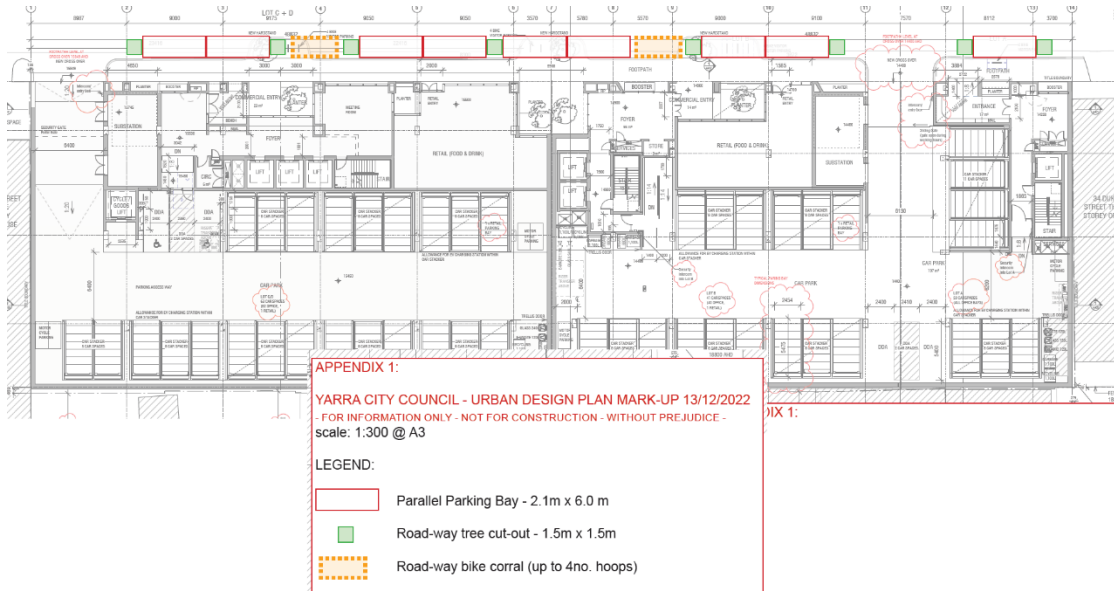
Urban Design Plan Mark-up Plan provided by Council’s Urban Design Unit.
